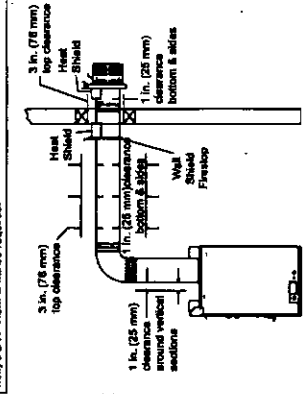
Minimum Horizontal Venting Clearances to Combustible Materials
